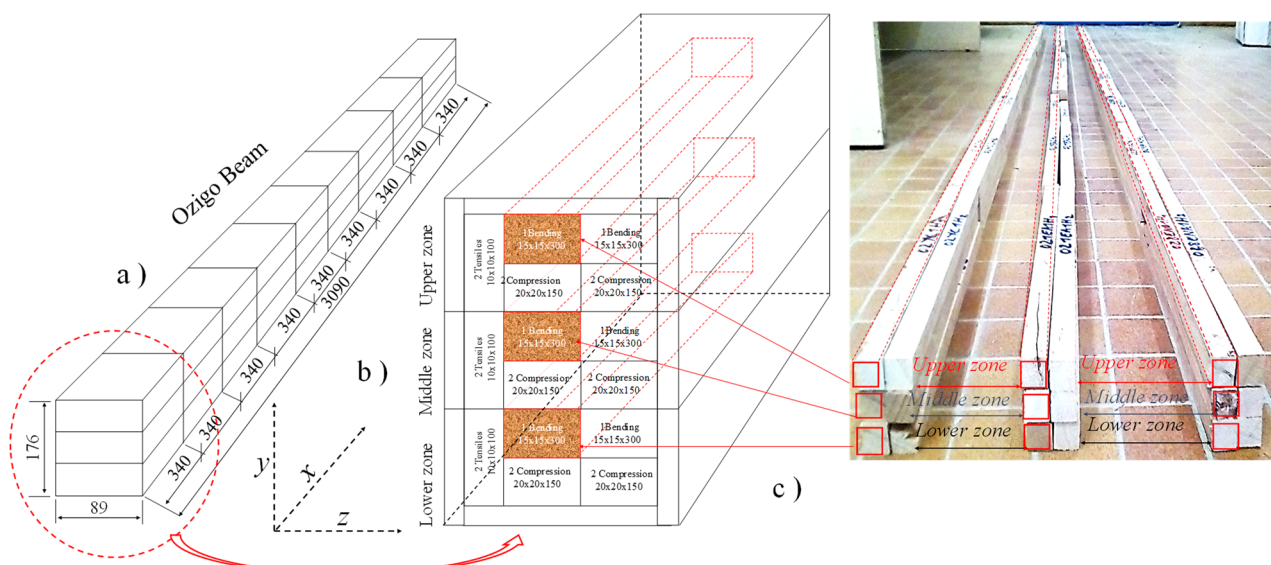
Spatial representation of the beam: (a) Beam cutting plane. (b) Arrangement of specimens in a section of the beam. (c) Cross-section of the specimens from the three environments.
